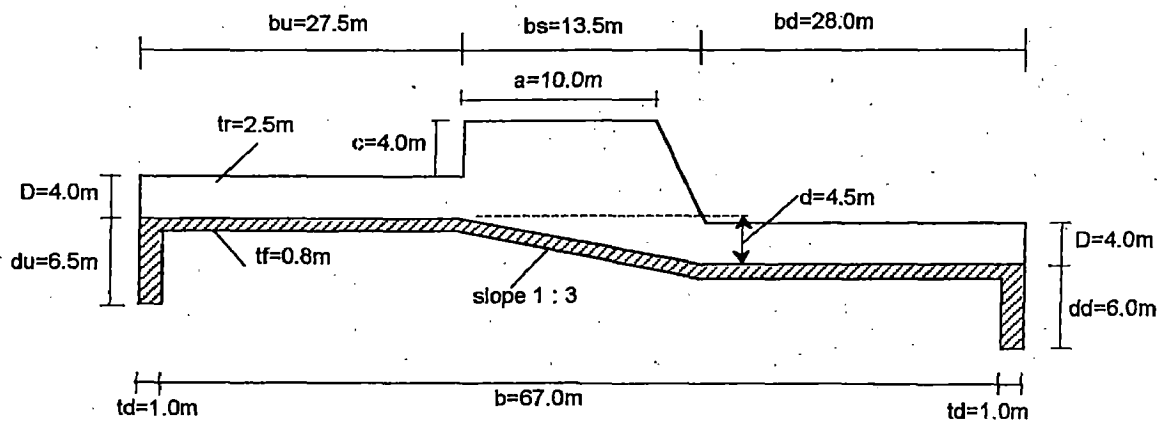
Barrage with Floating Floor and Ribbed Foundation
